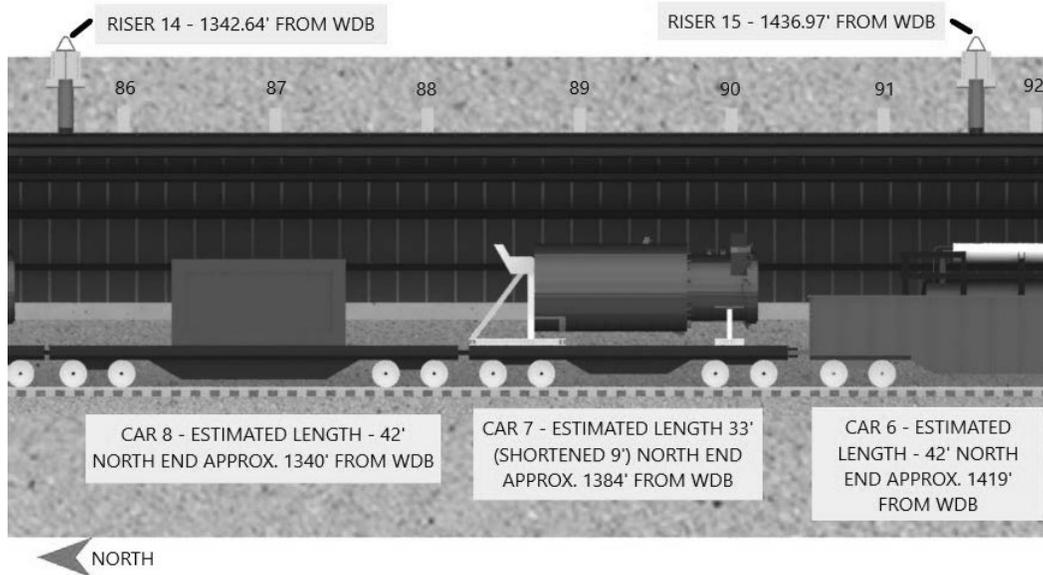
Riser 14 to Riser 15 Tunnel Section.
